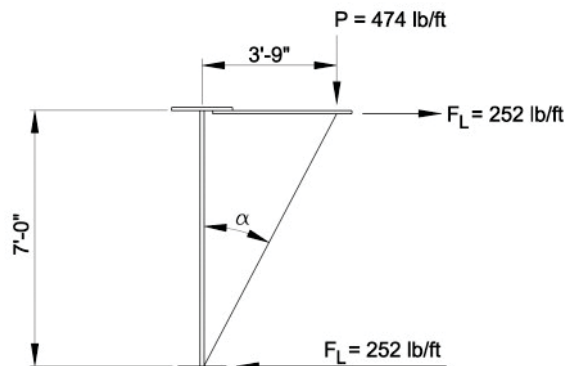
Schematic of construction overhang loads applied to the fascia girder
